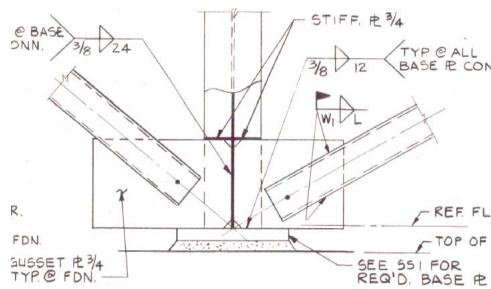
Bottom Connection Detail (86WA3A--10-HF-1)
